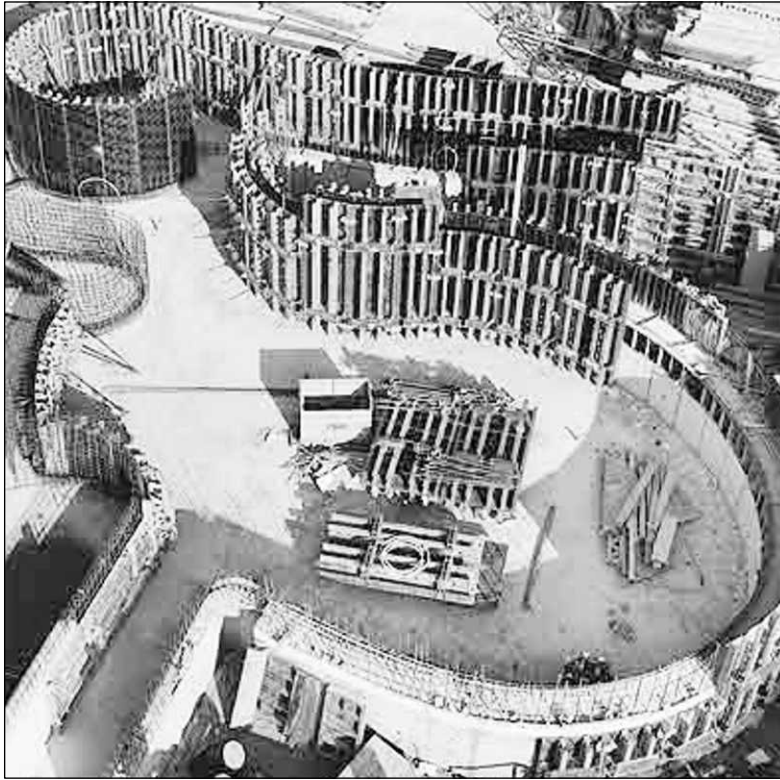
A Typical Rundflex Wall Formwork System (Courtesy PERI).
